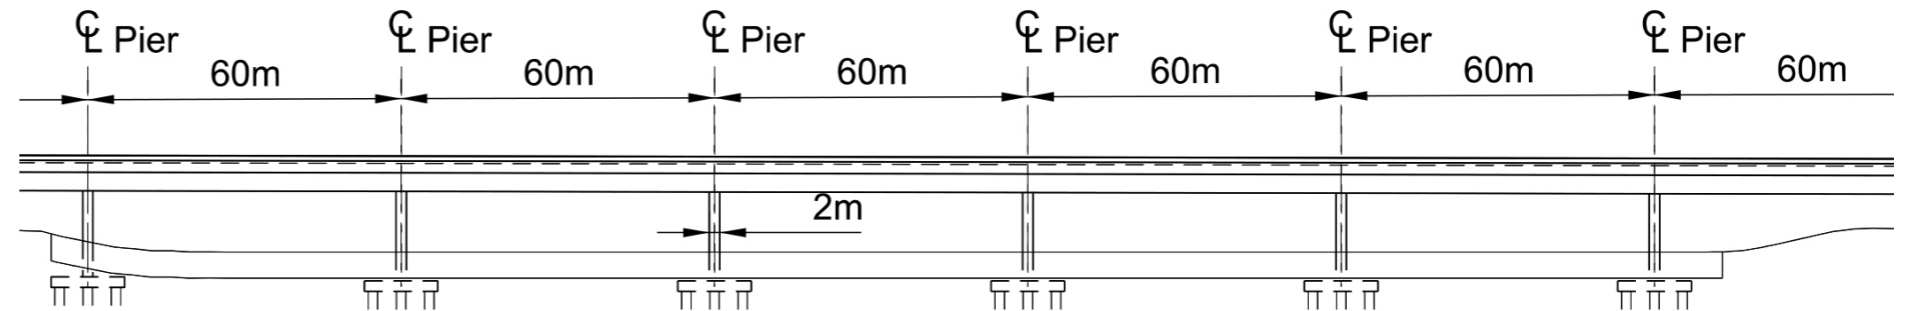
\_ HS2 Ltd design to support Hybrid Bill - Proposed elevations over water
